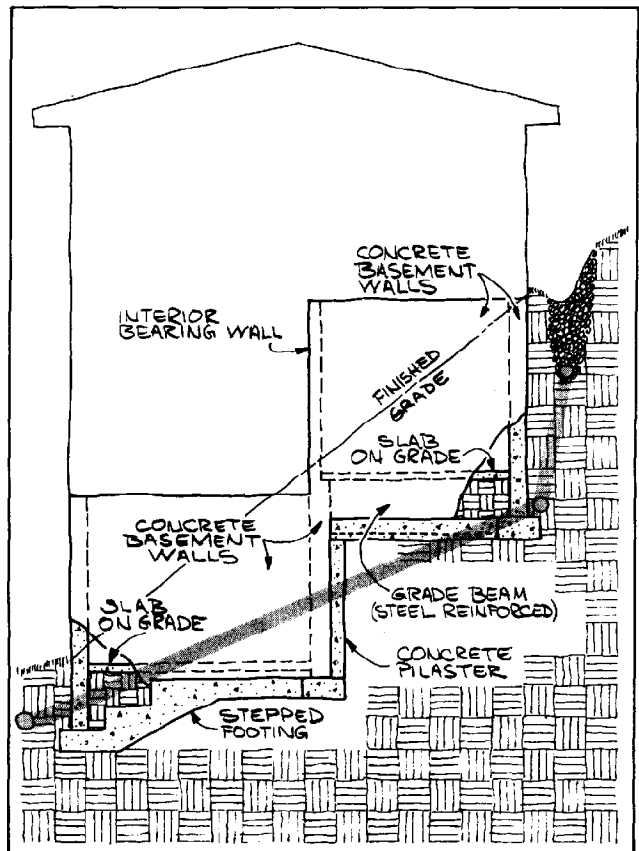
This hillside house uses slabs at two elevations to eliminate the need for an extra tall foundation wall. The upper wall and footing are reinforced to act as a grade beam. Note the uphill interceptor drain which diverts water to the subdrain system.
